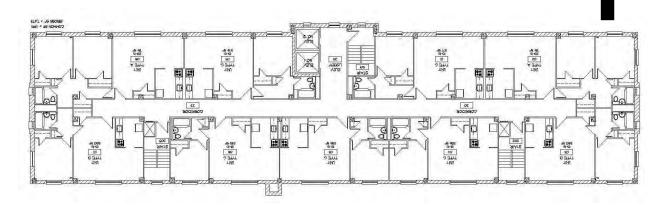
Existing conditions of typical floor plan. Note: There is no evidence that apartment partitions were relocated or removed, suggesting that the existing configuration is original. Source: Stark Wilson Duncan Architects.
